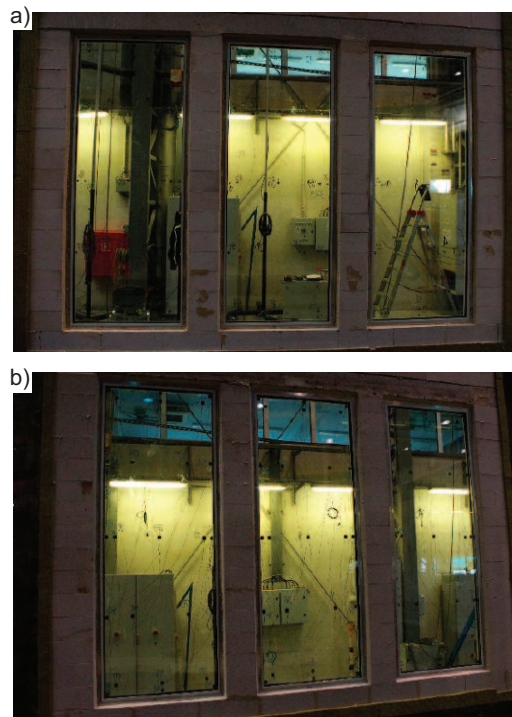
Heated surface of the test pieces prior to fire resistance testing: a) double-glazed units with a 12 mm frame; b) double-glazed units with an 18 mm frame
